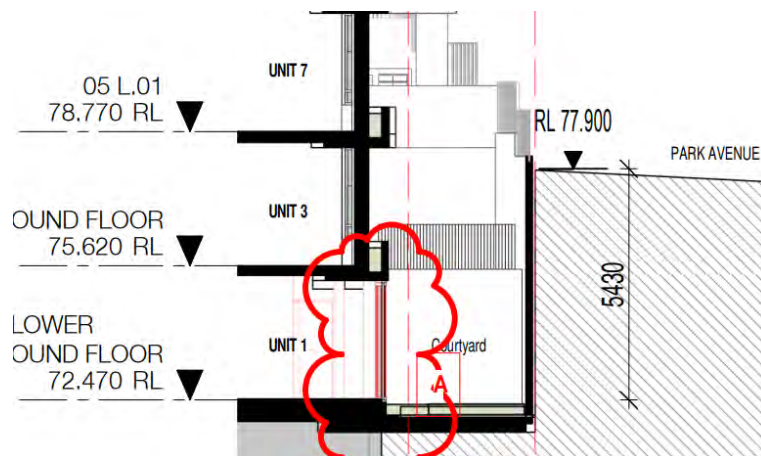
Proposed Section through Bedroom 2 or Unit 1
